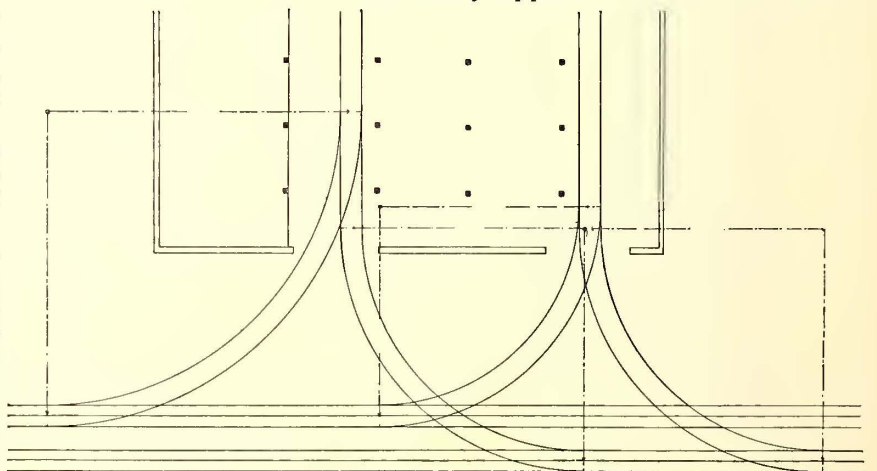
NEW PLAN OF COTTAGE GROVE AVENUE CAR HOUSE—CHICAGO CITY RAILWAY.
